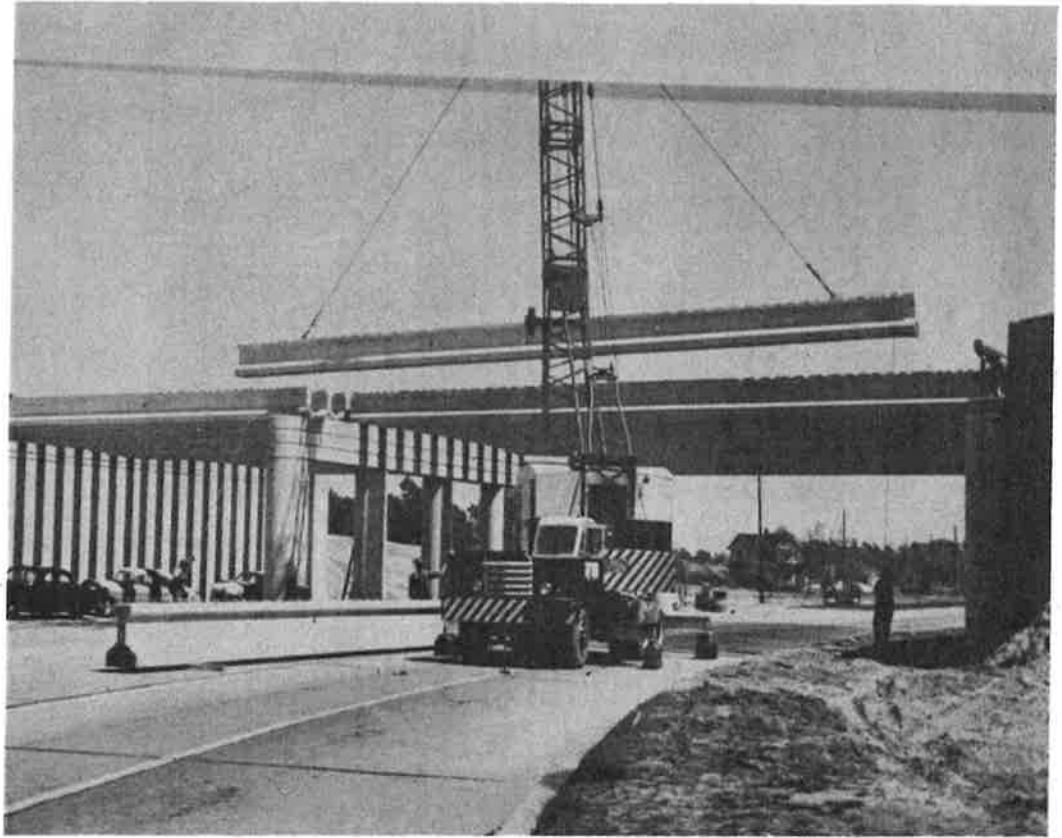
Prestressed beams erected at site over US 322, Garden State Parkway bridges, Section II.
